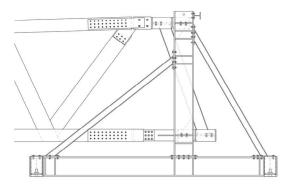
Steel supporting structure for the large-scale test with truss-half, side view
